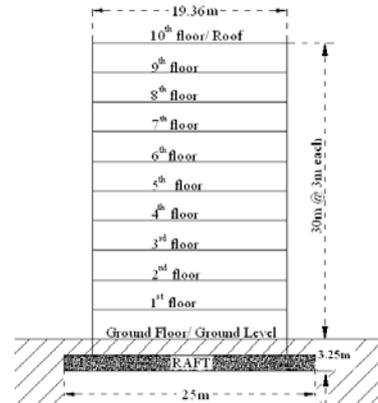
(b) Elevation in N-S direction of RPOSQ building
